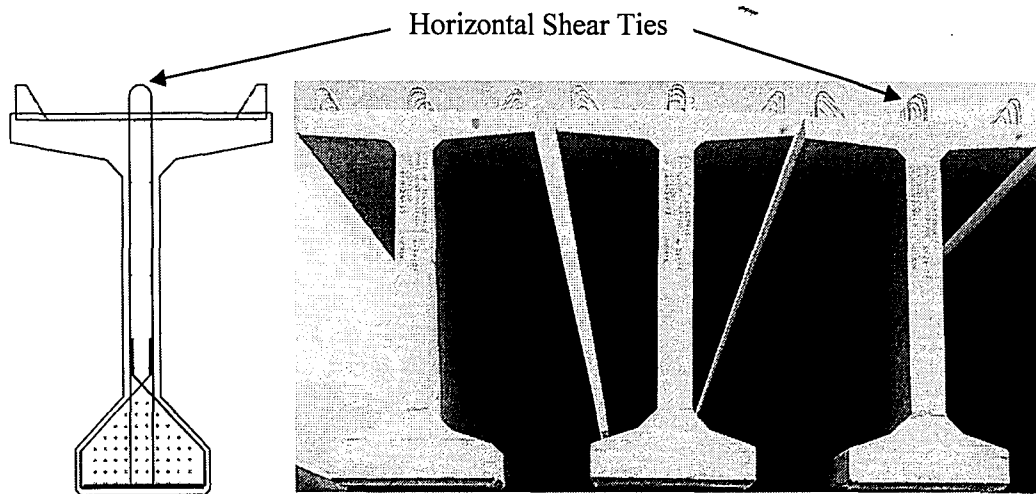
Horizontal Shear Ties in Bulb Tee Precast Bridge Beams
